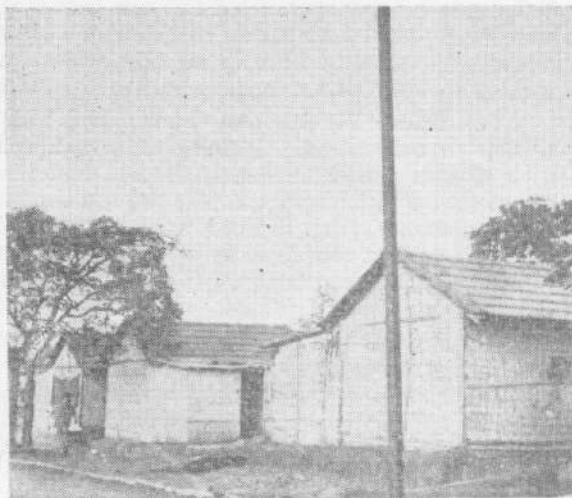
Tatty houses, with walls of split bamboo mats nailed on timber posts, supporting the tiled roofs, which did not suffer any damage.
